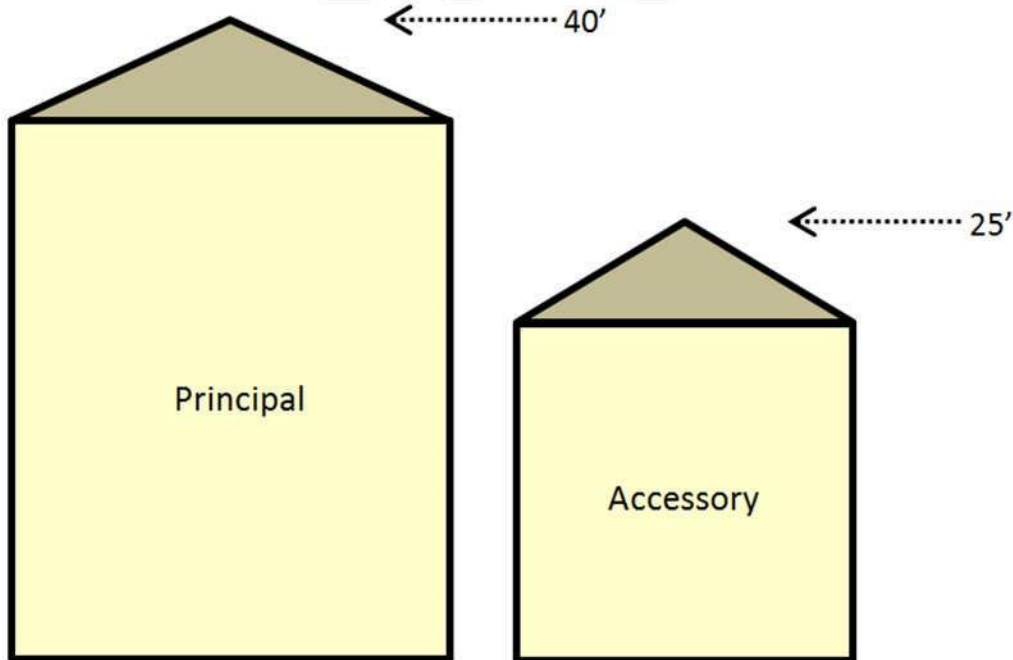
Typical VMU-1 Zoning District Building Height Example (Abutting Lots Not Developed)(Not Drawn to Scale)
